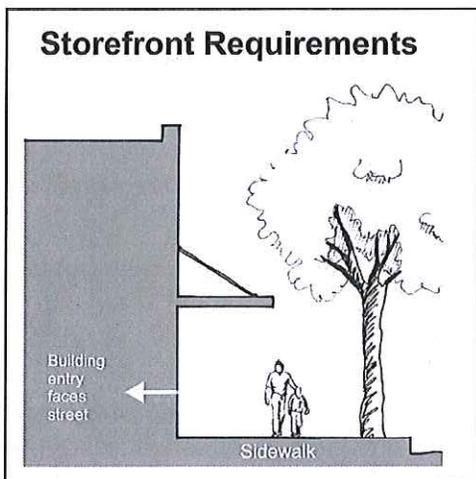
Building incorporating weather protection and storefront windows along a primary pedestrian façade.
